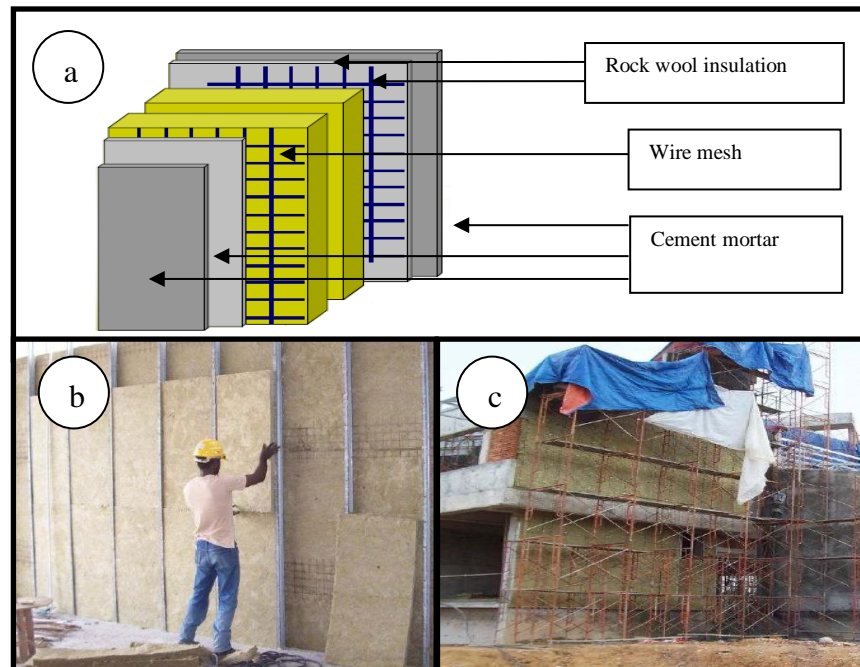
(a) Office building external wall (b) & (c) External wall installed with insulation system during construction of the building
